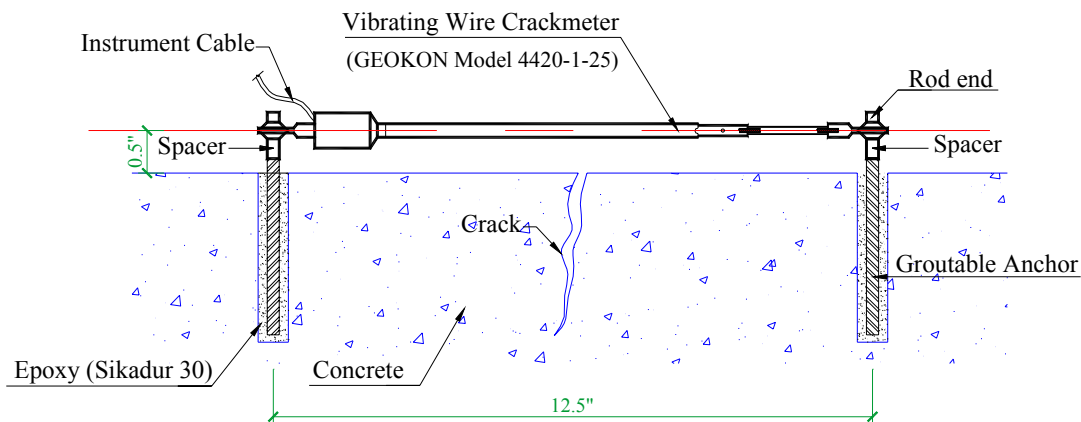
Installation detail of Vibrating Wire Crackmeter
